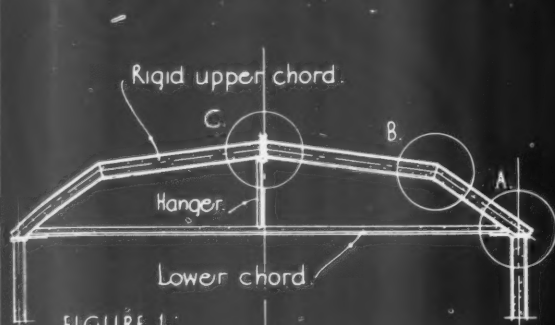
TYPICAL CONSTRUCTION OF TRUSS WITHOUT DIAGONALS.
